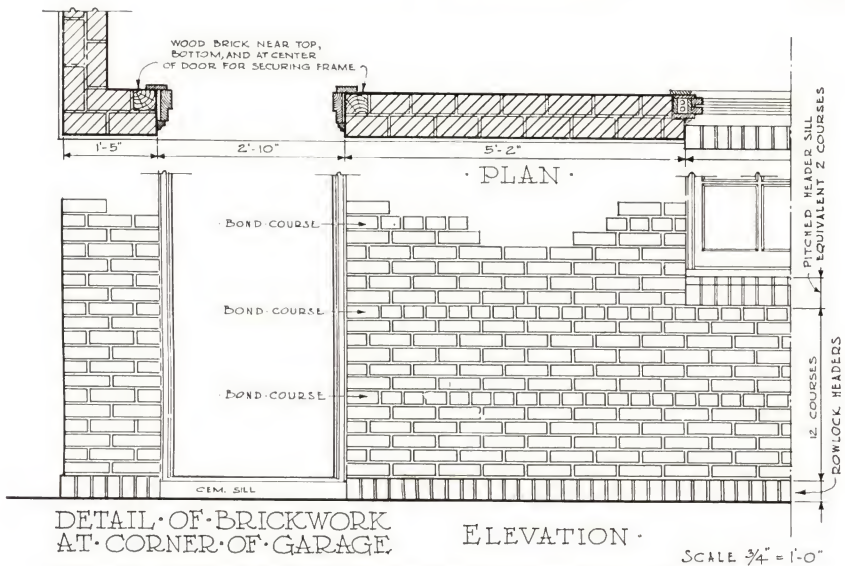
Enlarged detail of wall showing brick courses laid up in common bond.
